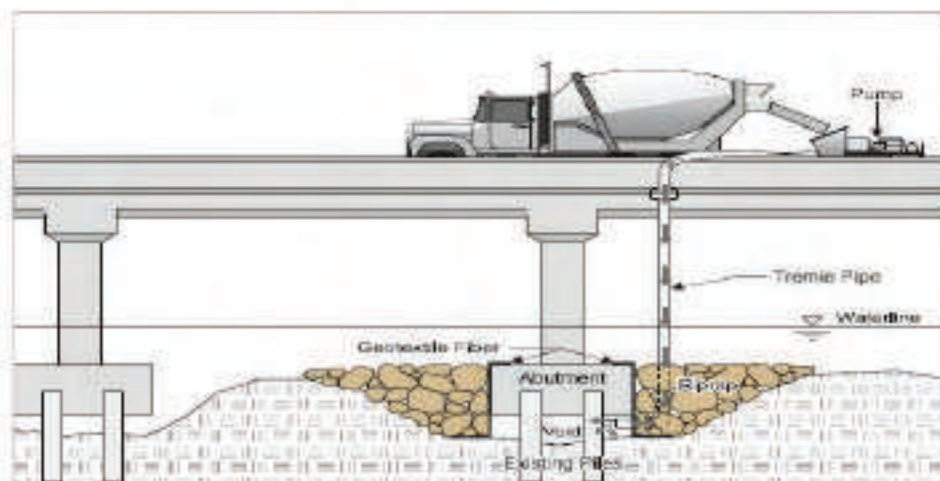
Tremie Concrete Placement used to Repair an Undermined Pile Cap
